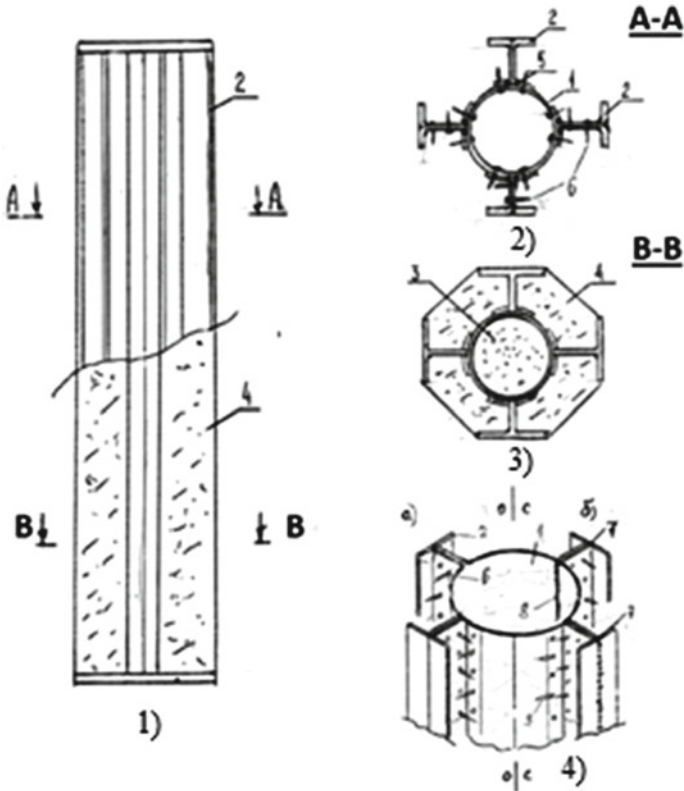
General view of a steel–concrete rack (steel part in cross-section, perspective view and cross-section of the rack after concrete casting)
